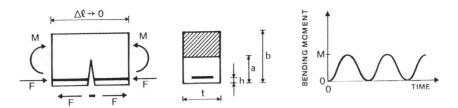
Cracked reinforced concrete beam cross section, subjected to unidirectional cyclic bending moment.
